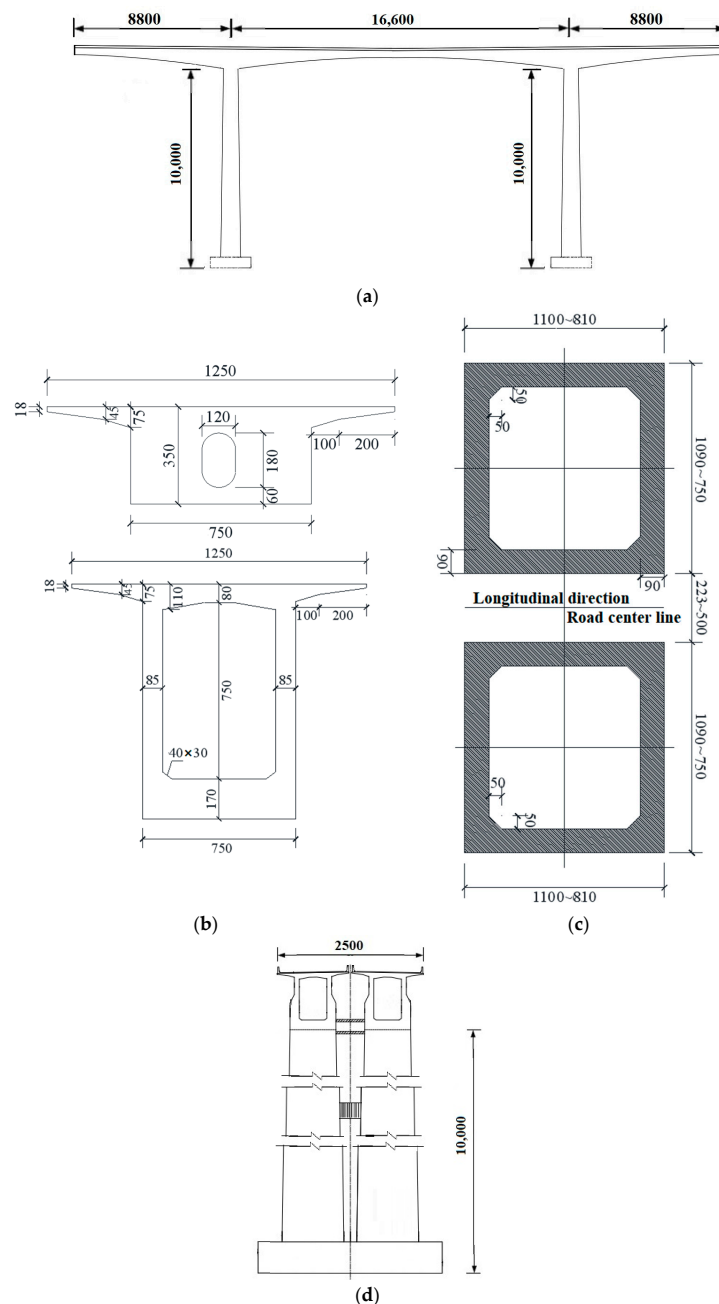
Structural dimensions of the prototype bridge (unit: cm): (a) External dimensions of the bridge specimen; (b) Sections of the main beam; (c) Sections of the pier; (d) Cross section of the bridge.
